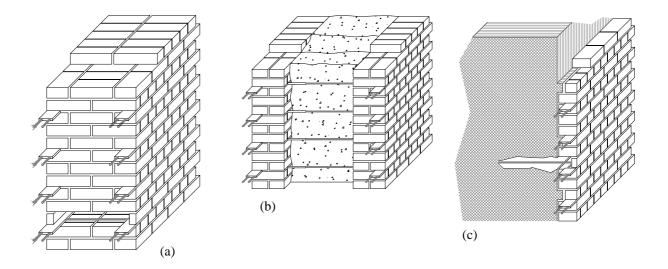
Examples of applications of deep rejointing: (a) one layer loading bearing wall, (b) multi-leaf with external loading bearing layers, (c) multi-leaf masonry wall with non-structural external layer
